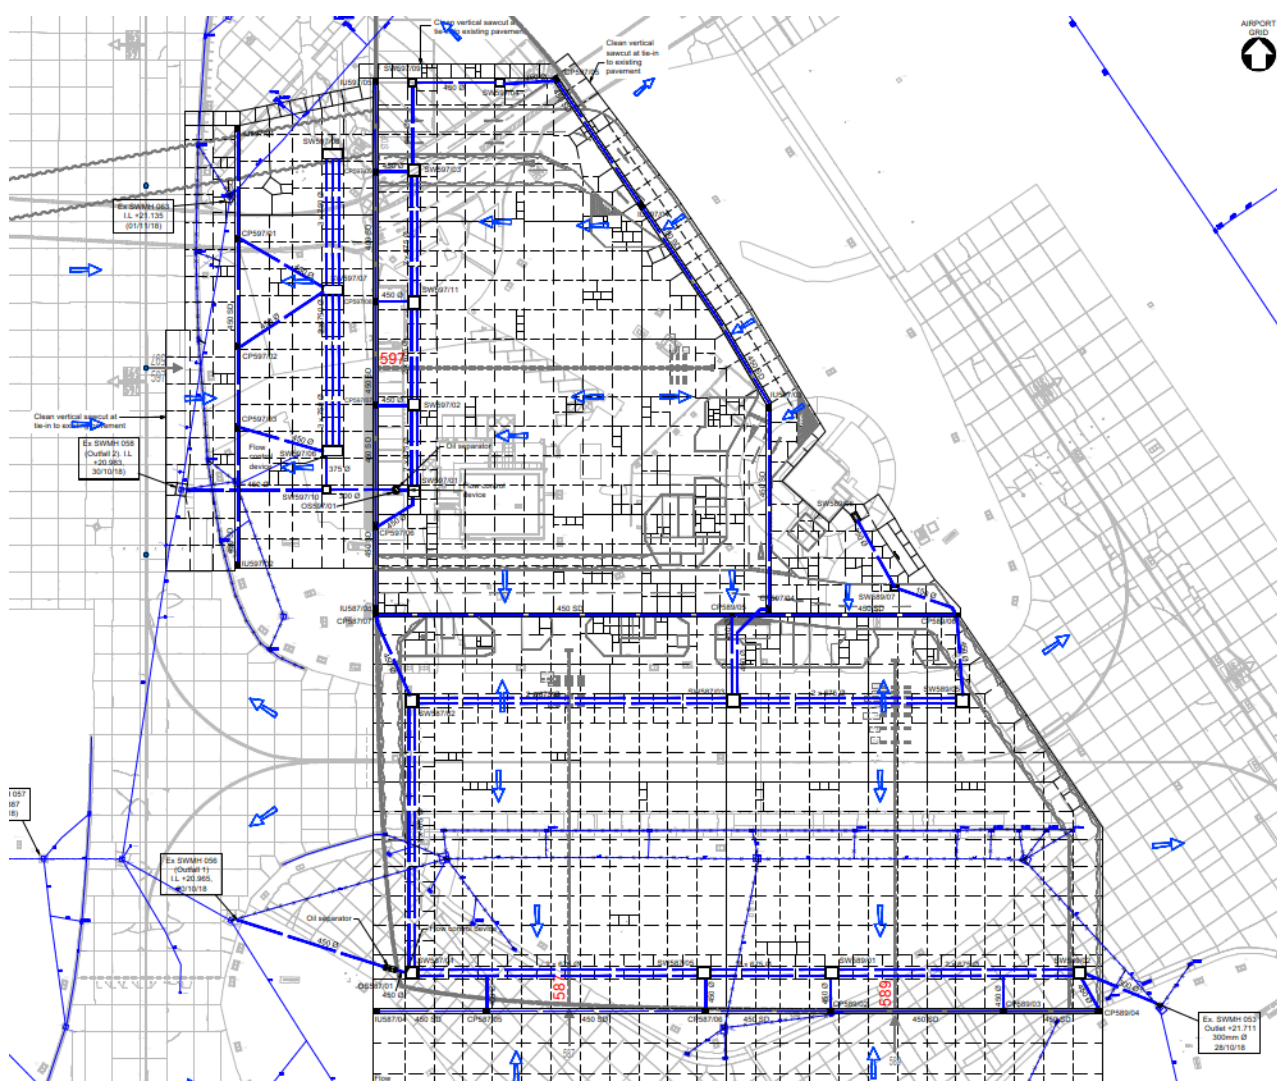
GA20 Stands Layout with Proposed Surface Water Drainage
